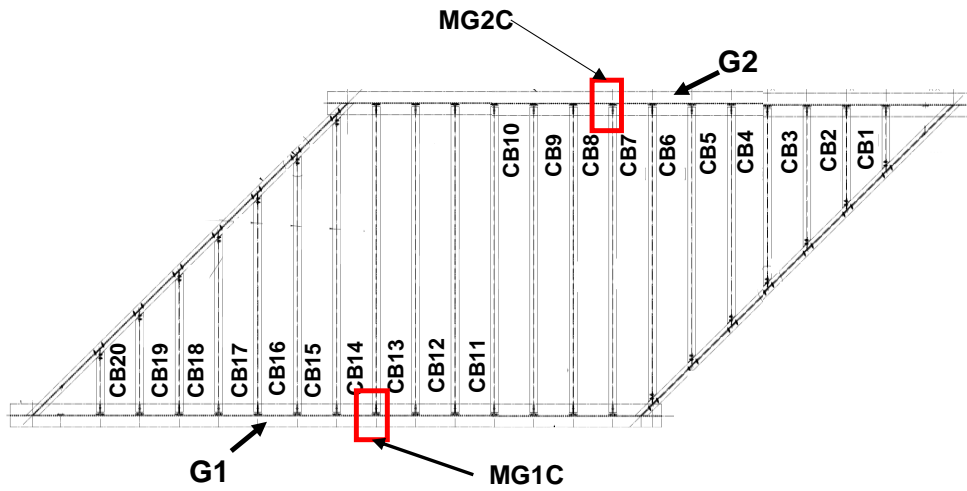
Location of connection to be instrumented at the Mineral Line Bridge.
